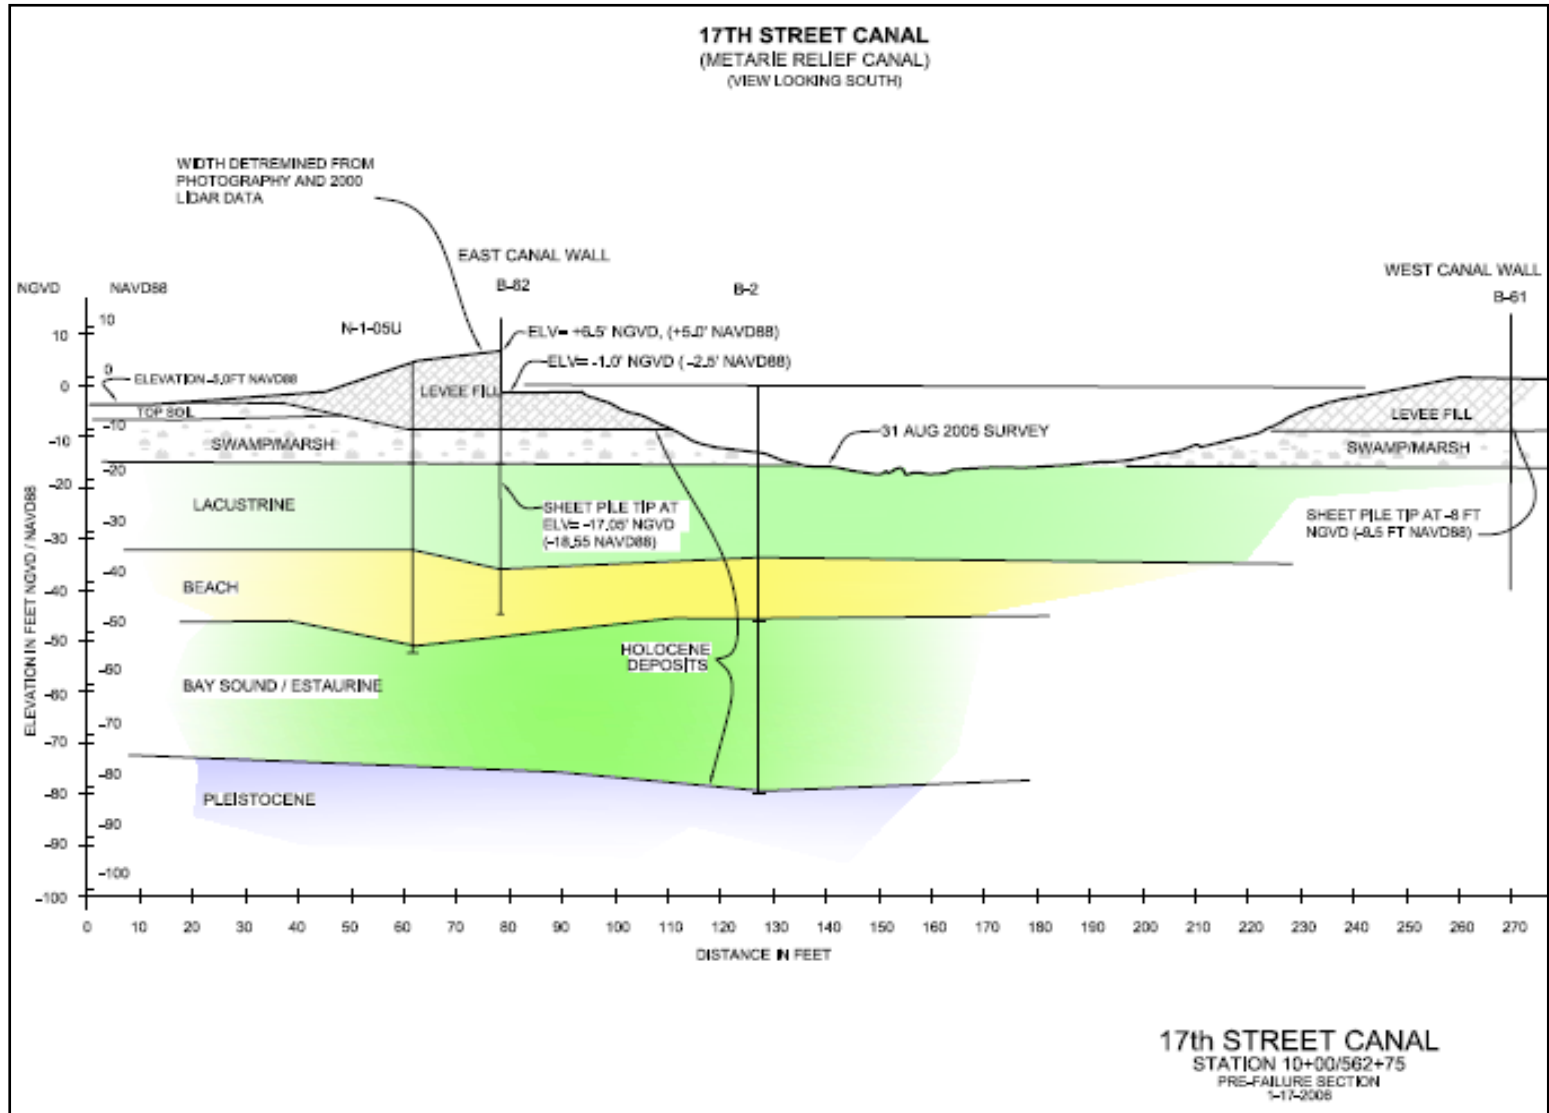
Prefailure cross section 17th Street Canal breach (New Stationing Sta 10+00) / (GDM Stationing Sta. 562+75).
